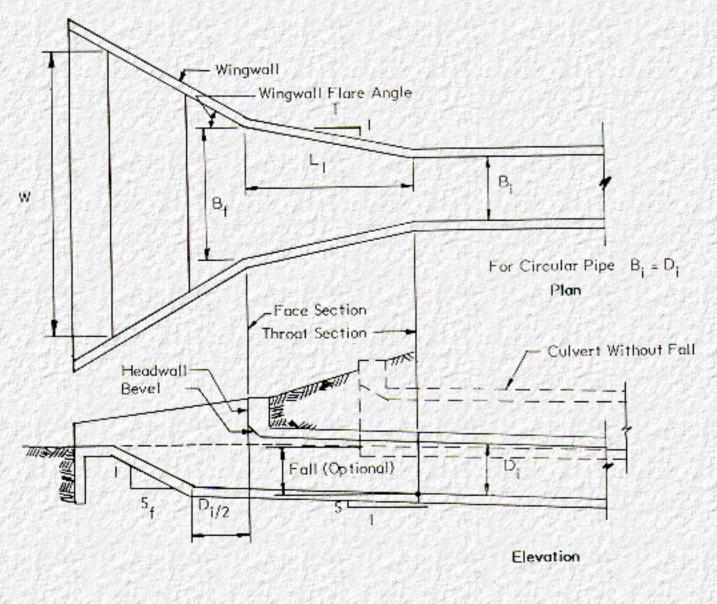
Side Tapered Box Section or Pipe Inlet Geometry
